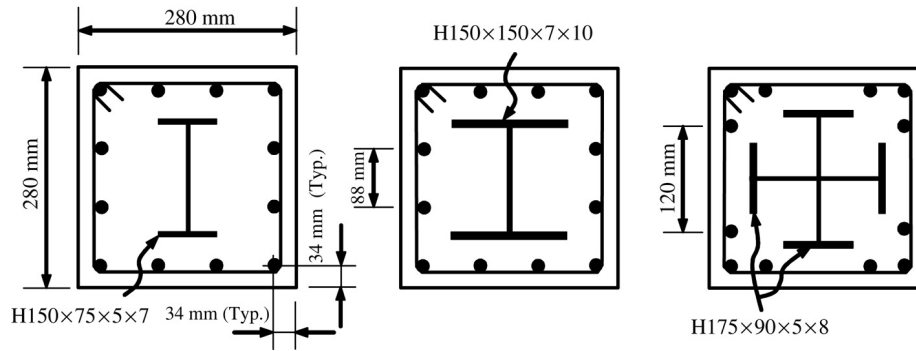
Cross sections of concrete encased steel composite columns with I-, H- and cross-shaped steel sections [21,22].
